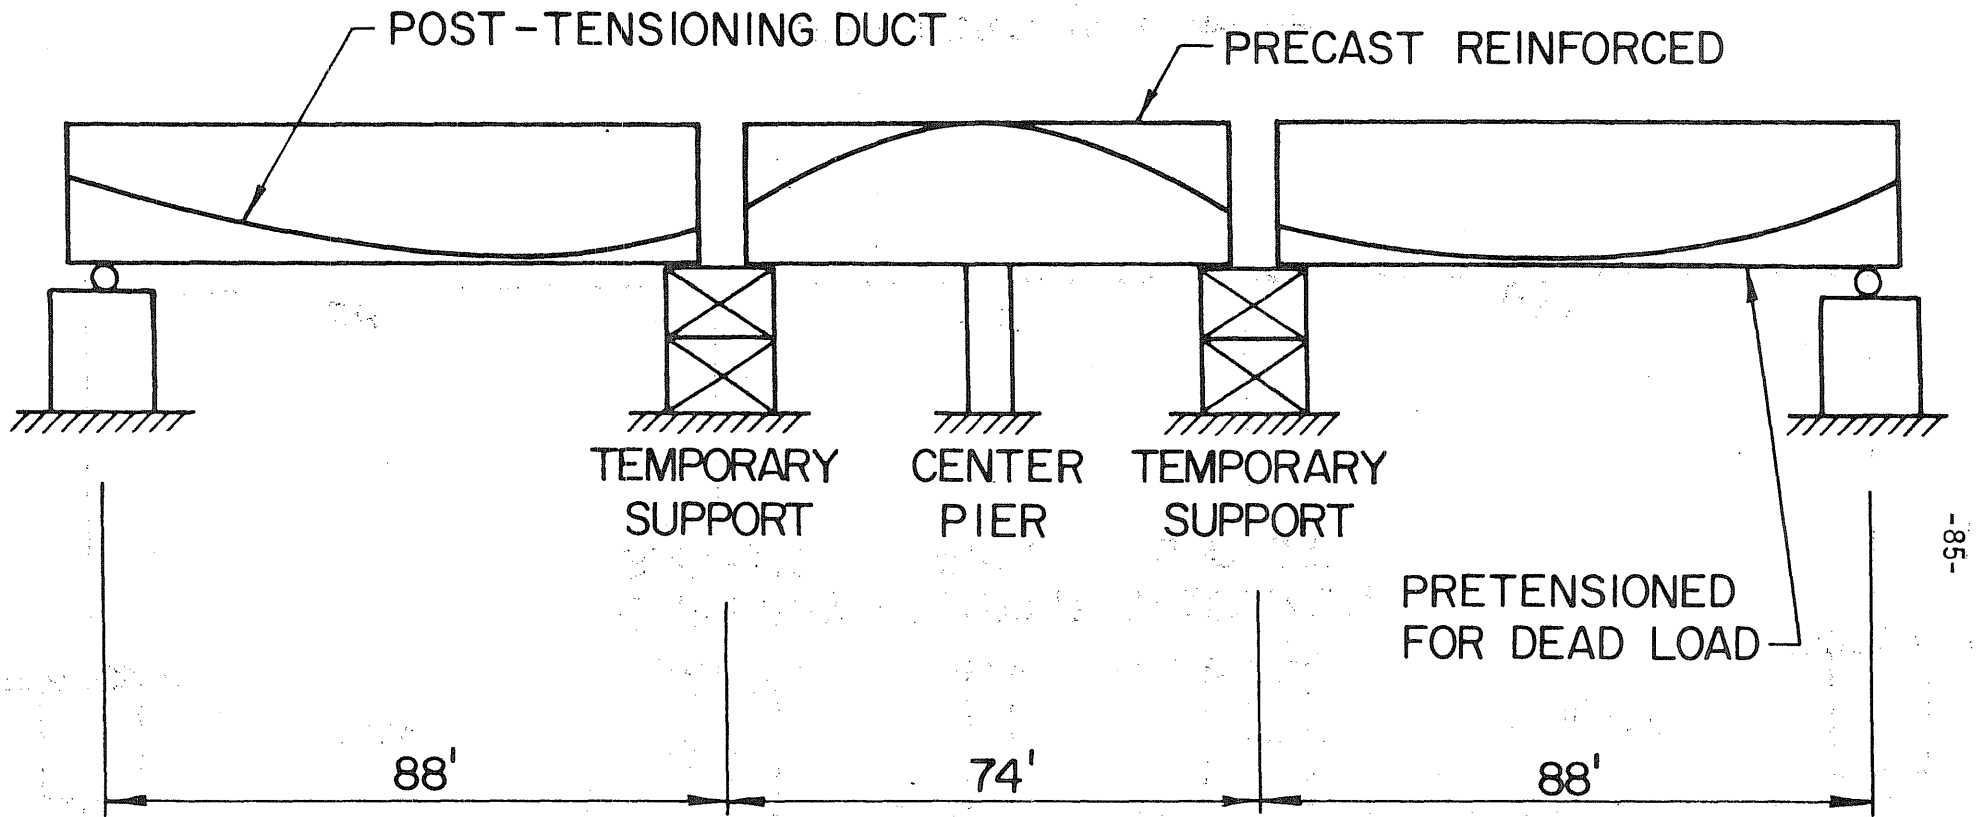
SEGMENTAL GIRDERS PLACED ON TEMPORARY AND FINAL SUPPORTS
